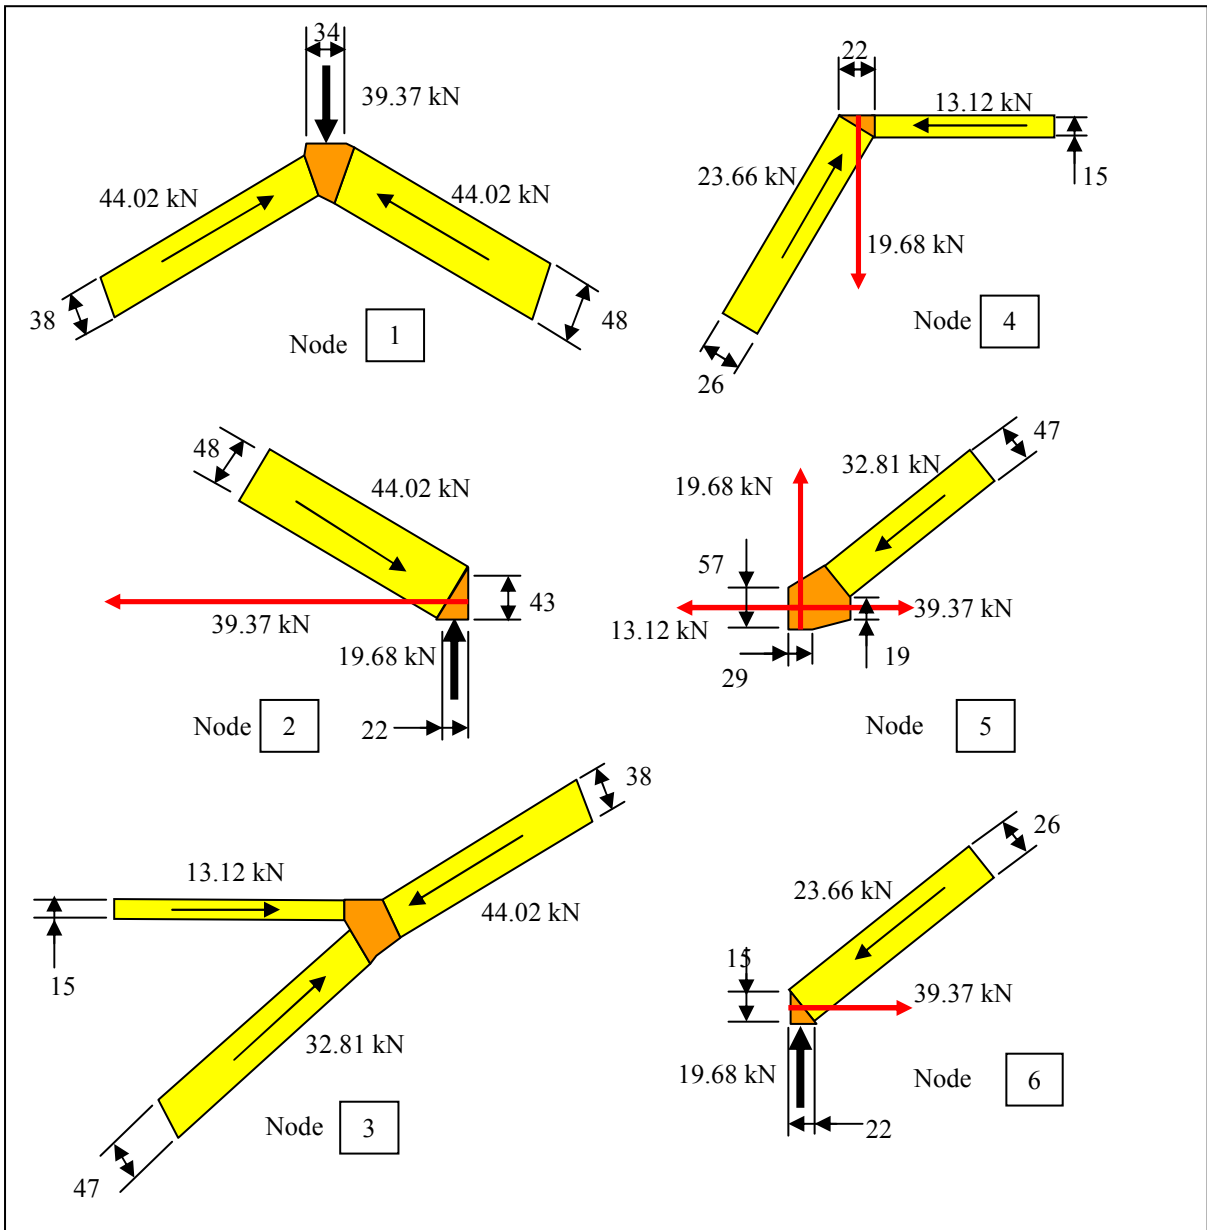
Truss nodal forces/reactions with widths of struts and nodal zone surfaces
